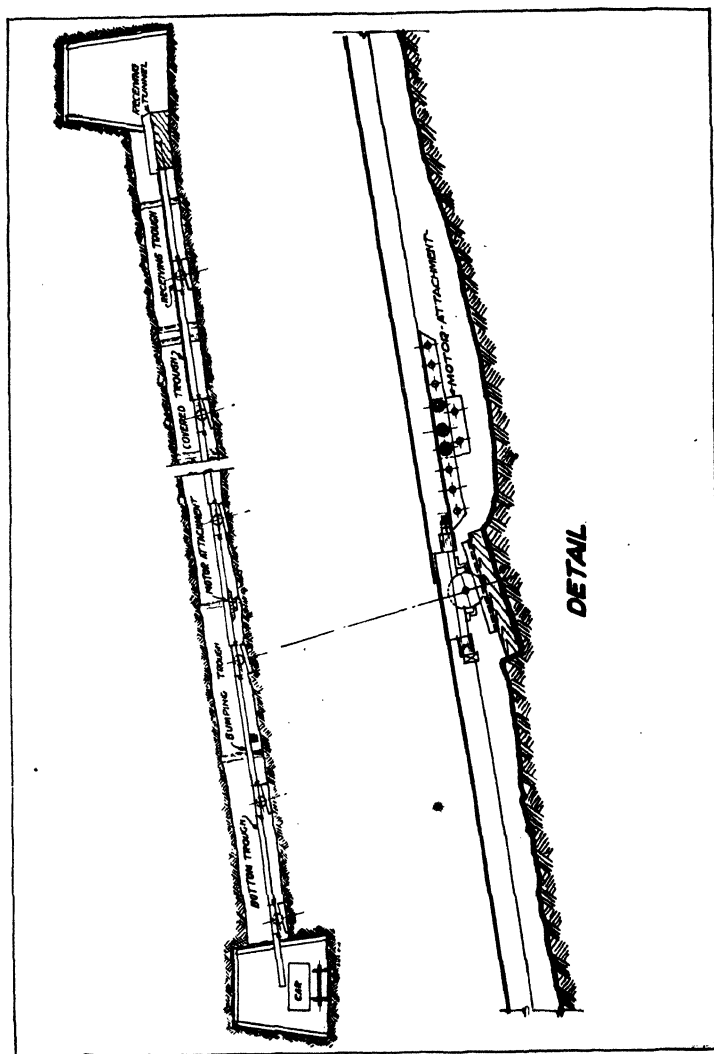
BUMPING TROUGH CONVEYOR FOR INCLINED SEAMS.
